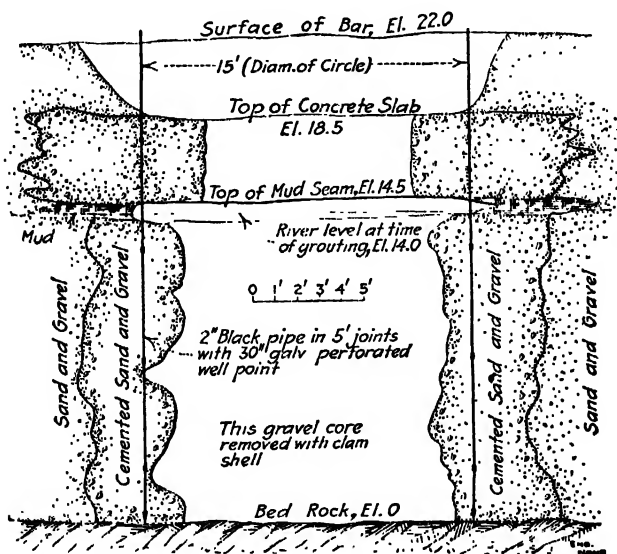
b*.—Typical Cross-Section of Concrete Cylinder Formed by the Circle of Grouting Pipes.
